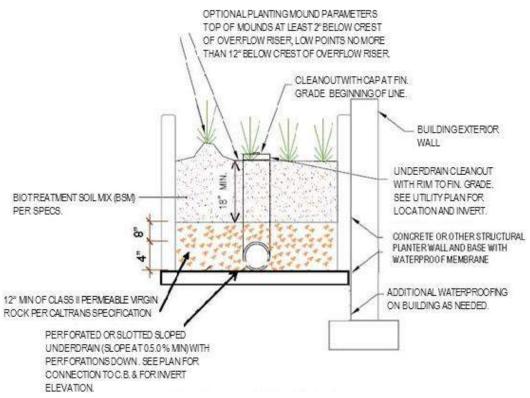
Cross-Section B-B of Flow Through Planter
